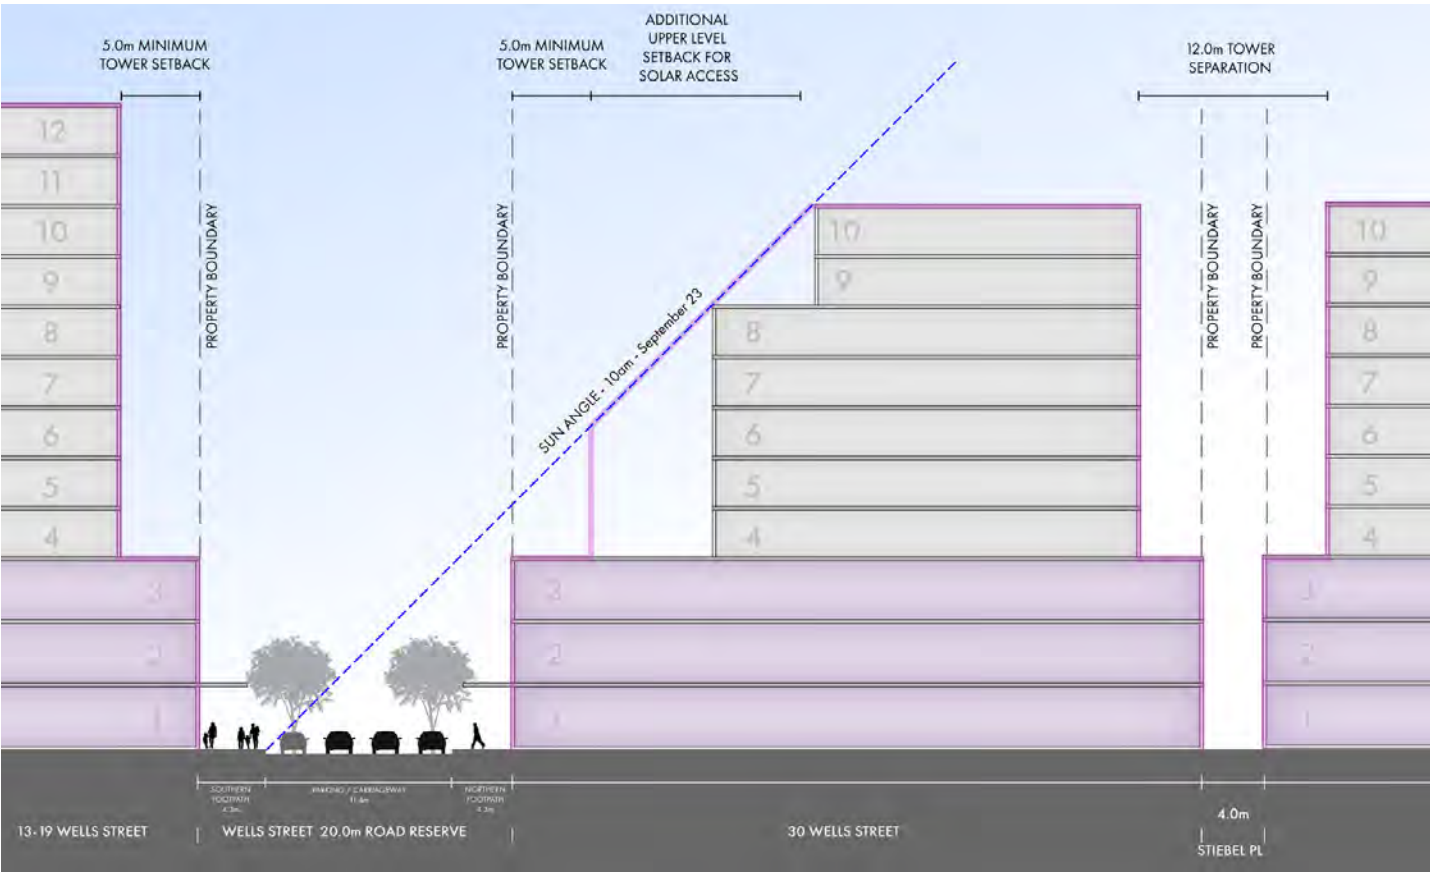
Wells Street Cross Section - Proposed building heights and sun angle
